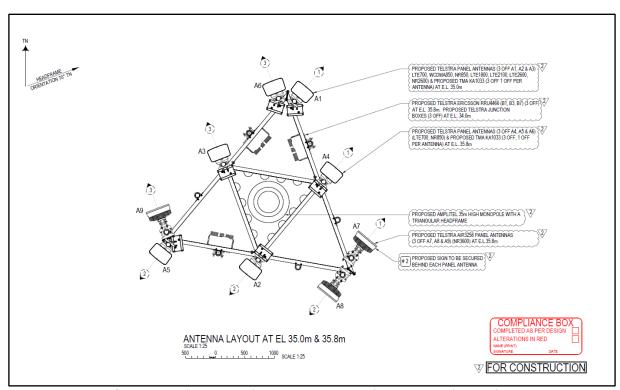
Replacement Telecommunications Facility – Antenna layout Plan
